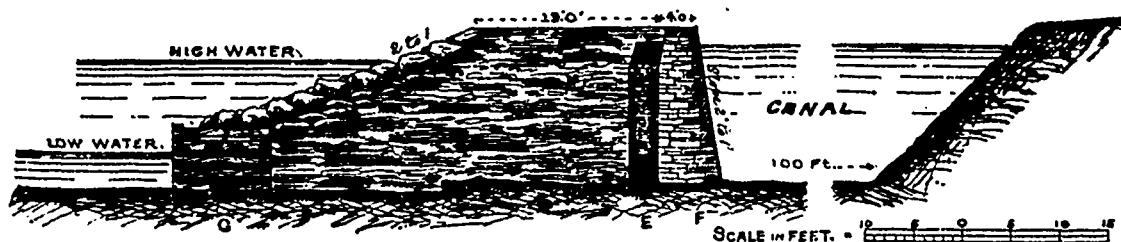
SECTION THROUGH CANAL EMBANKMENT.
